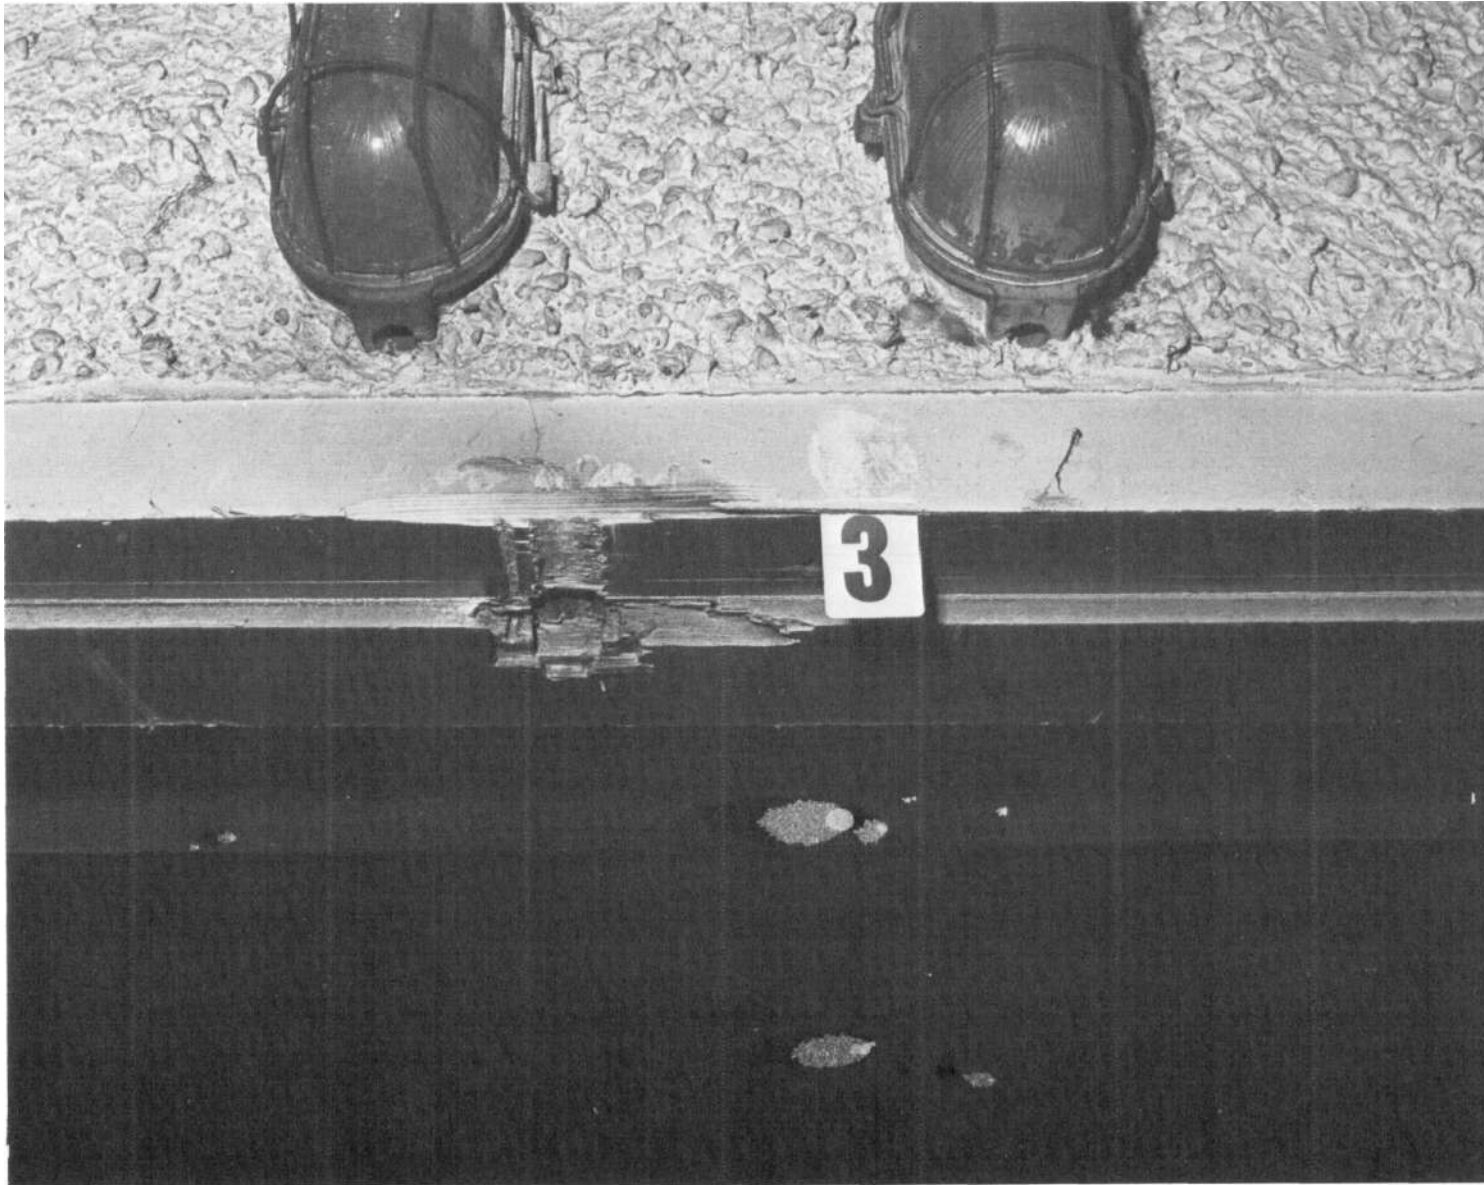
View showing damage to top of doorframe of outer Exit 3.
